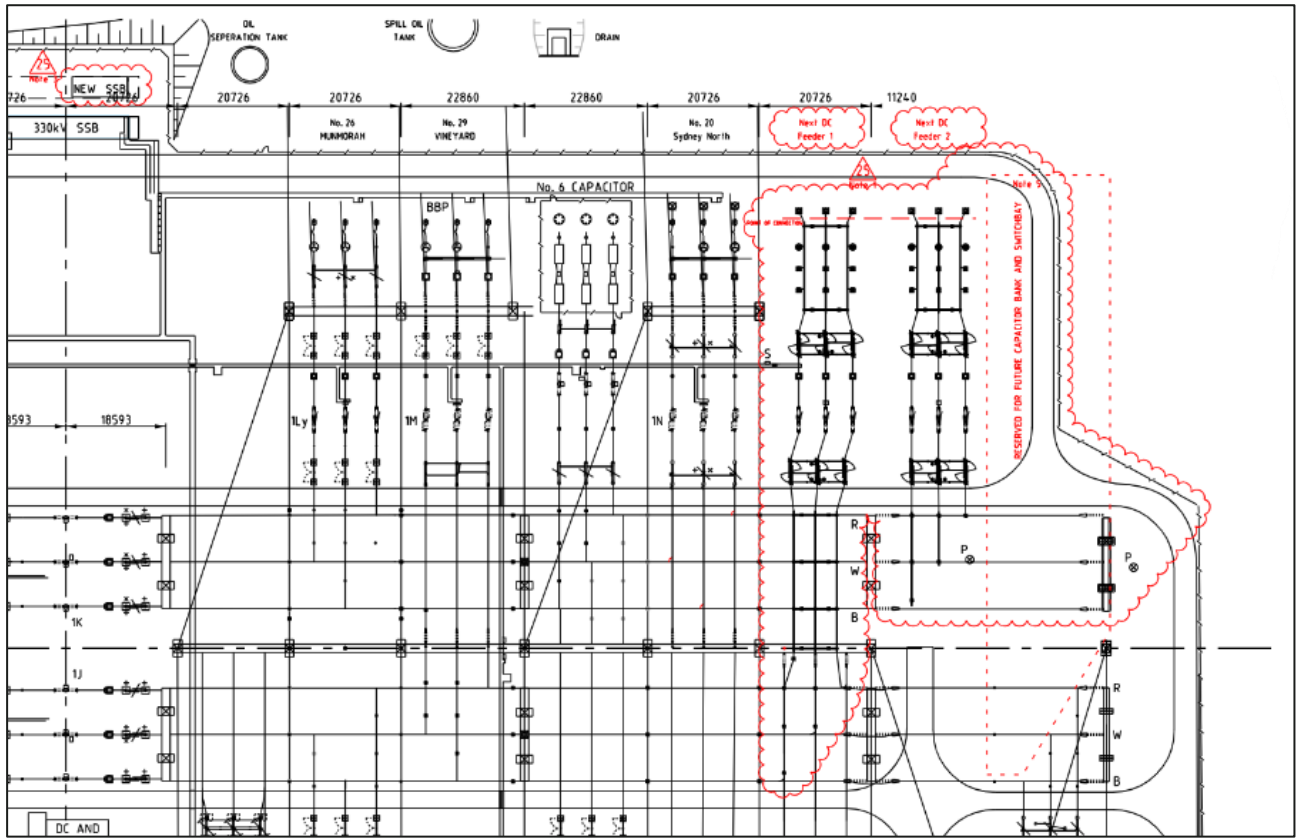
General Arrangement at Sydney West Transmission Substation
